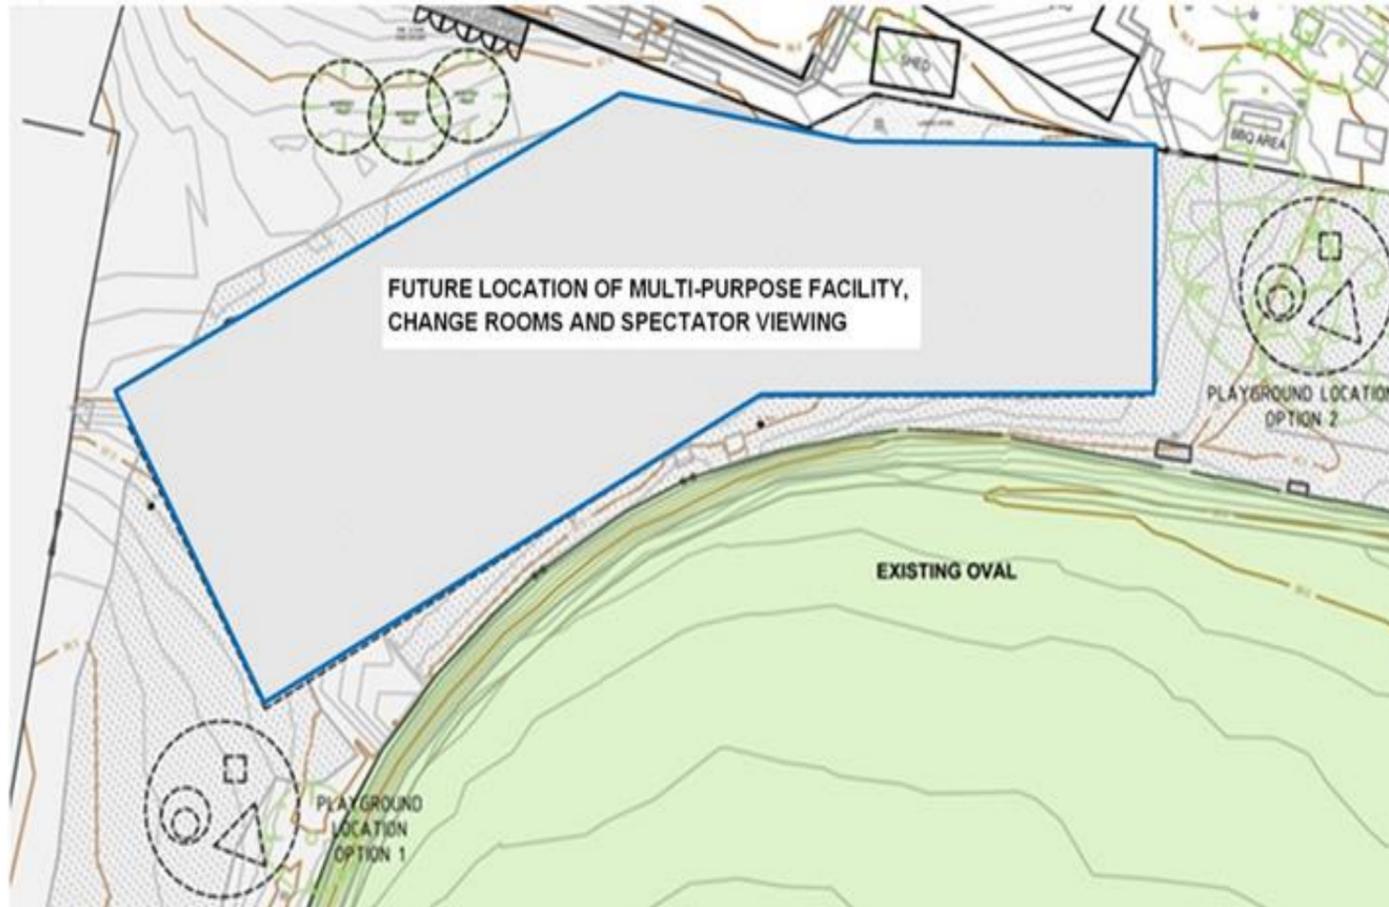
Illustrative sketch showing new multipurpose building and changeroom location
